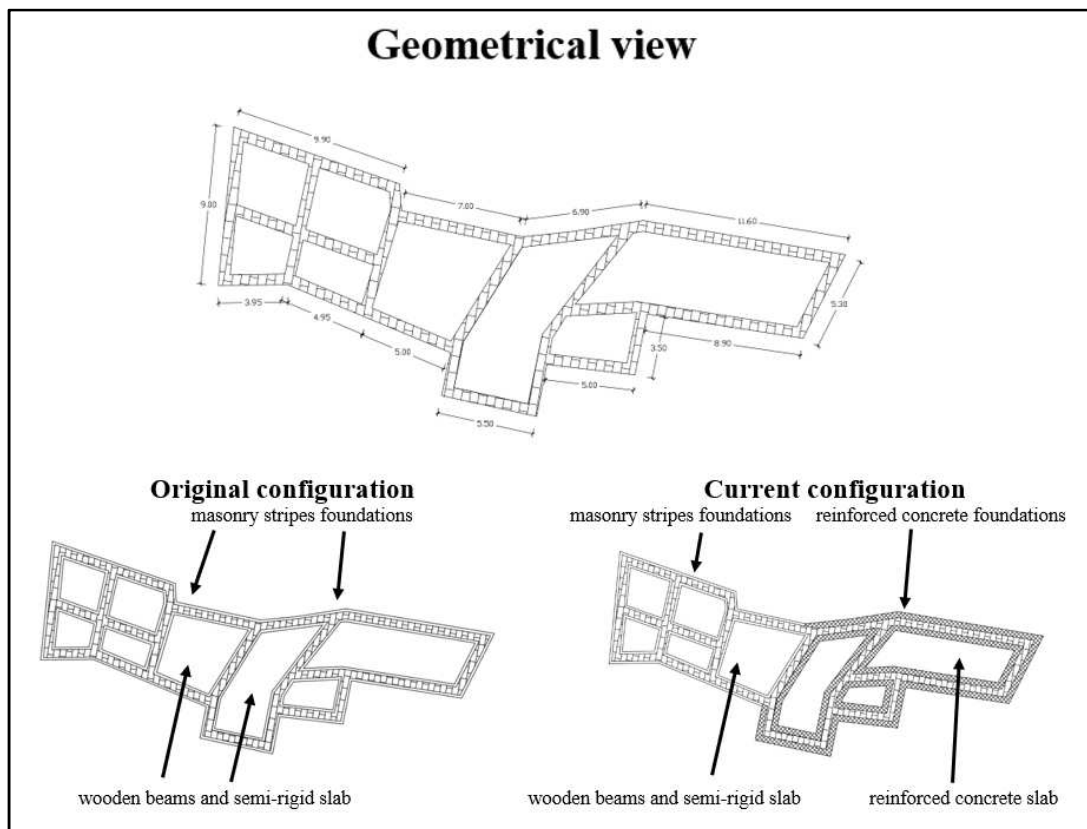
Schematic geometrical view of building aggregate plan in original (pre-intervention) and current (post-intervention) configurations.
